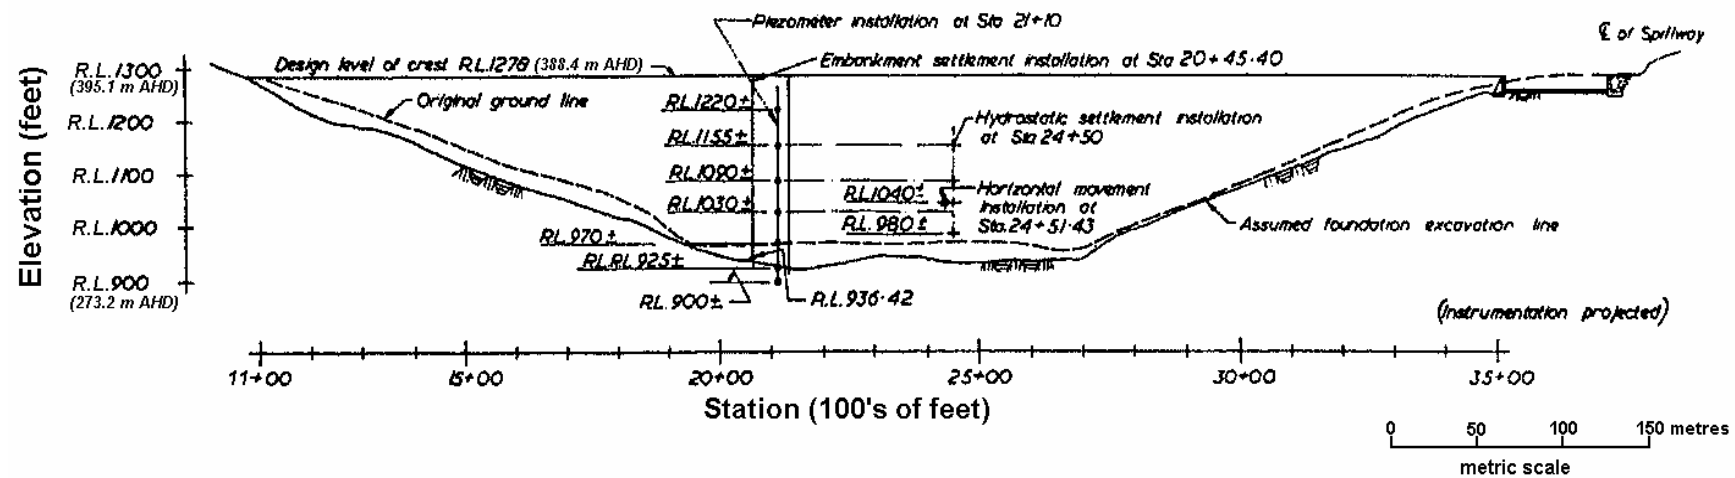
Long section profile of Blowering dam (courtesy of NSW Department of Public Works and Services, Dams and Civil Section).
